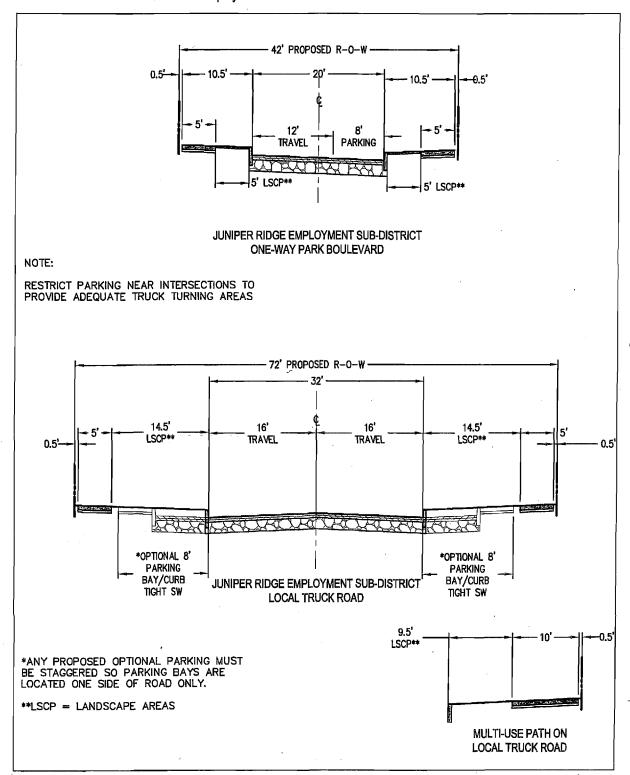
C.3 Employment Sub-District Street Cross Sections
